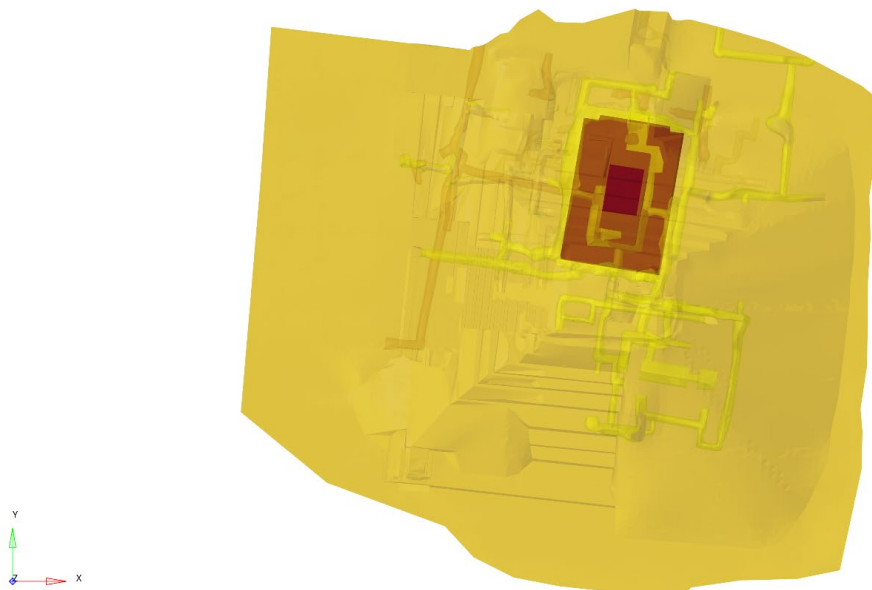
Plan view showing tunnel system modeled for configuration A.
